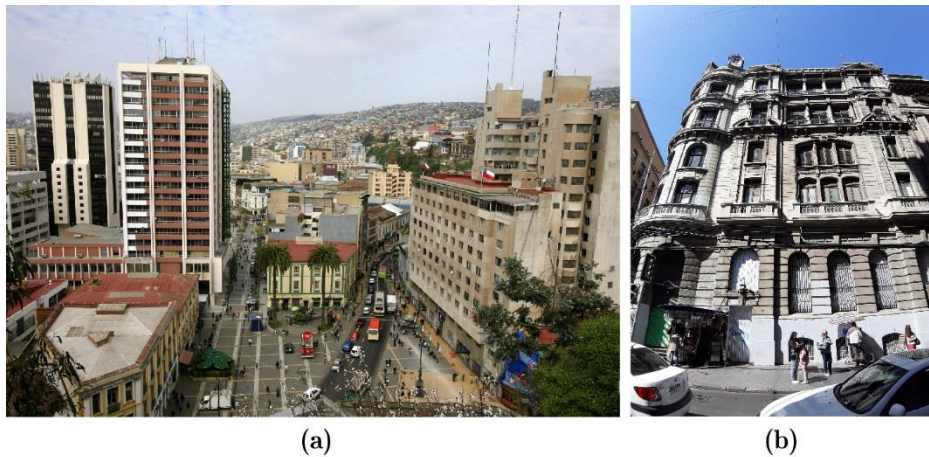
Reinforced concrete buildings (a) Tallest buildings in Almirante Montt square (label 61 and 62 in Figure 7-21) and (b) reinforced masonry building with critical damage in the masonry (label 0).
